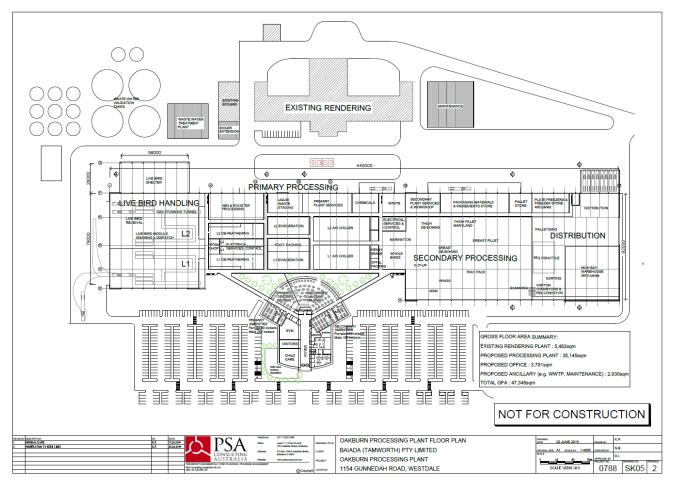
Processing Plant Floor Plan (Baiada, 2019)
